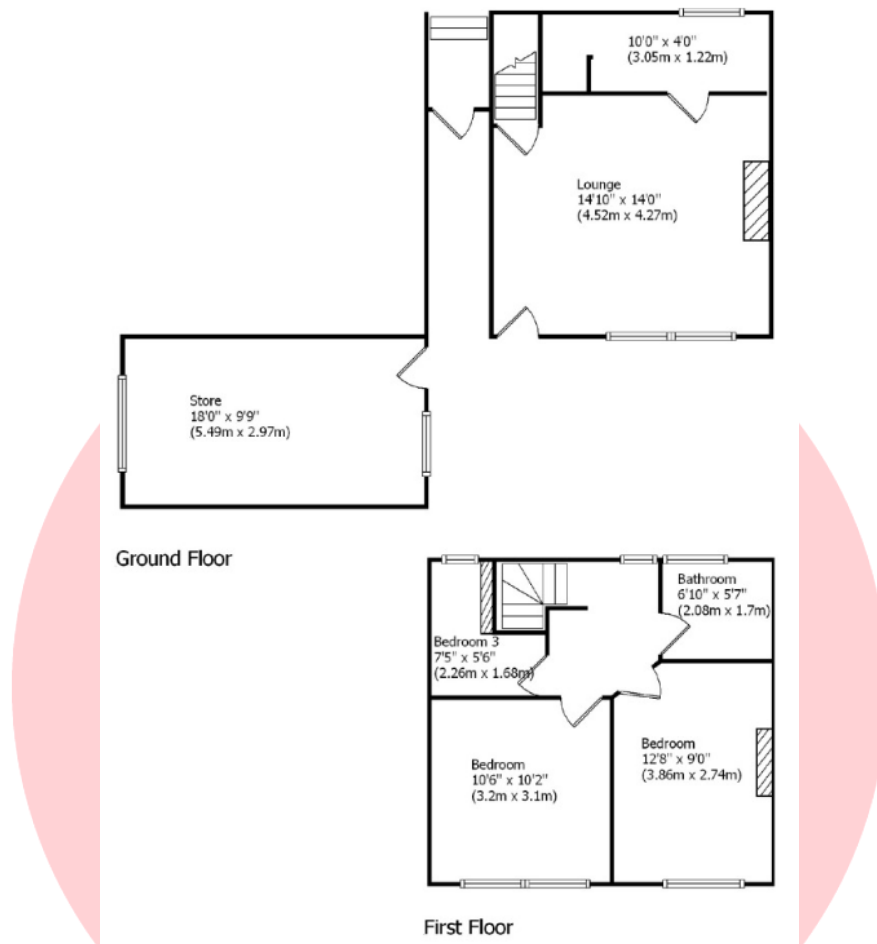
1 Water Street floorplan (as sourced from a Rightmove listing believed to be from June 2014)
